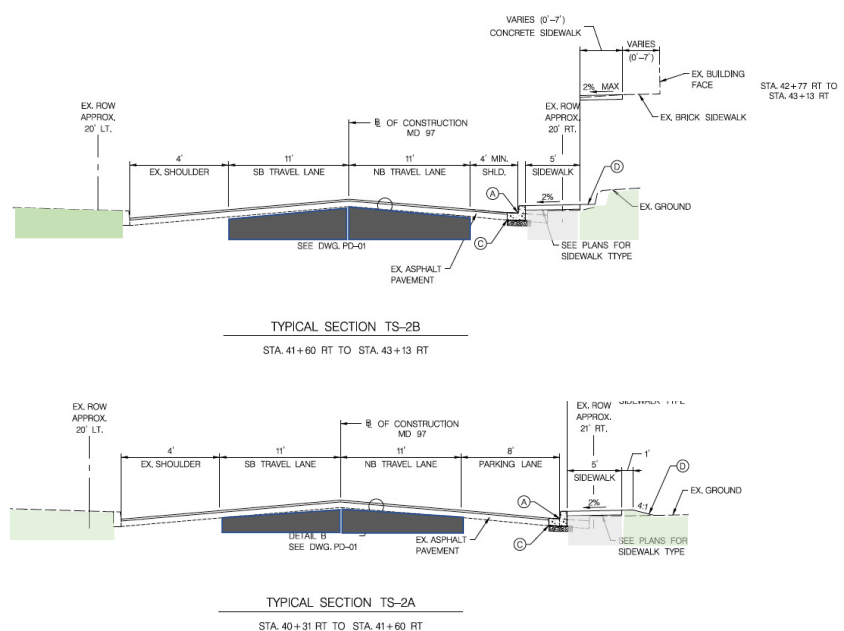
MDOT SHA sidewalk concept typical sections (May 2018)
